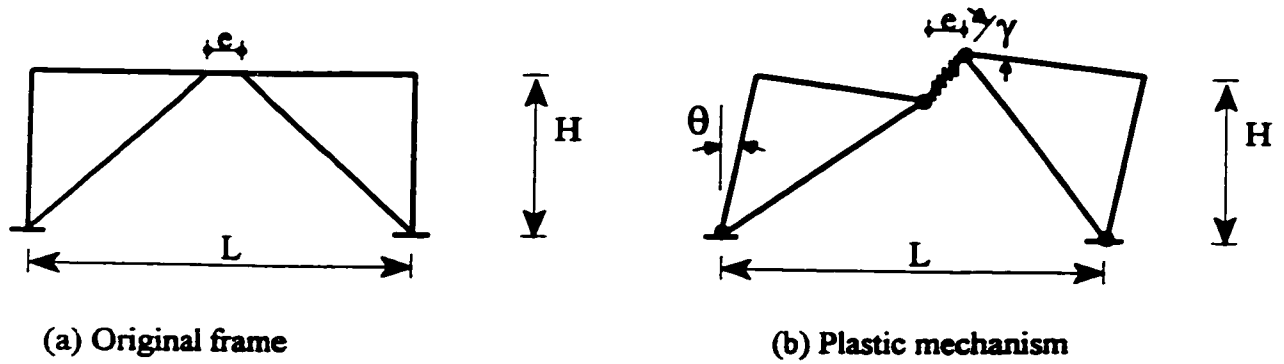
A plastic mechanism of an eccentrically braced steel frame
